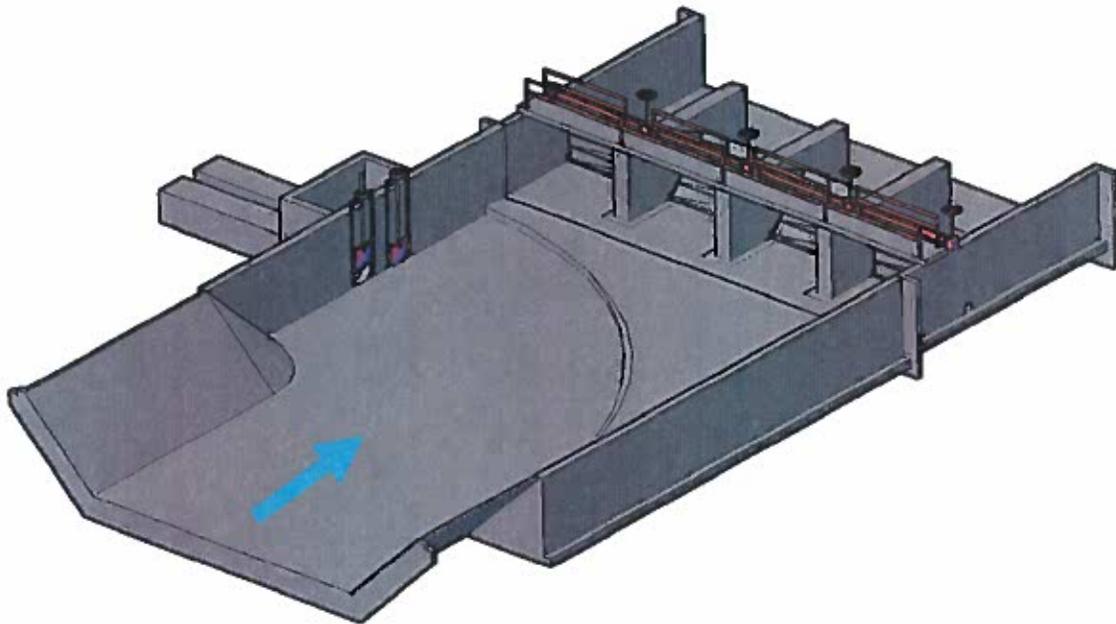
3D view of proposed design for new Westside first check structure and sluiceway
